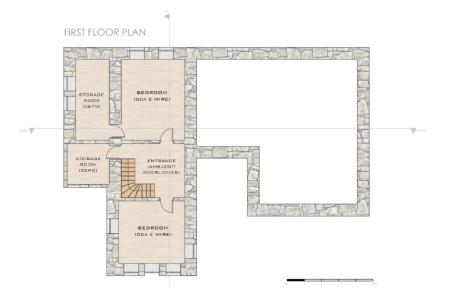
Beqiri, A. (2024). Adem Zeko House First floor
